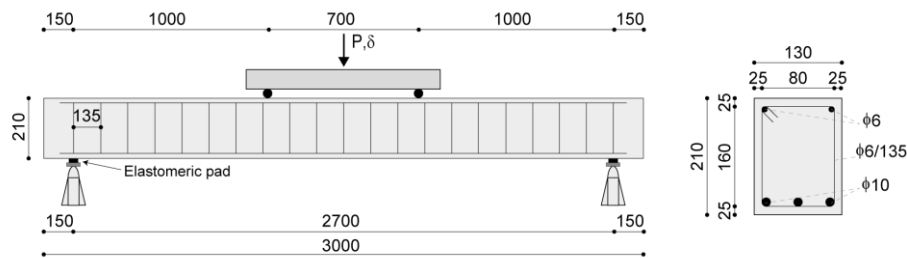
Geometry configuration and boundary conditions of the four-point bending test investigated (all dimensions are expressed in mm).
